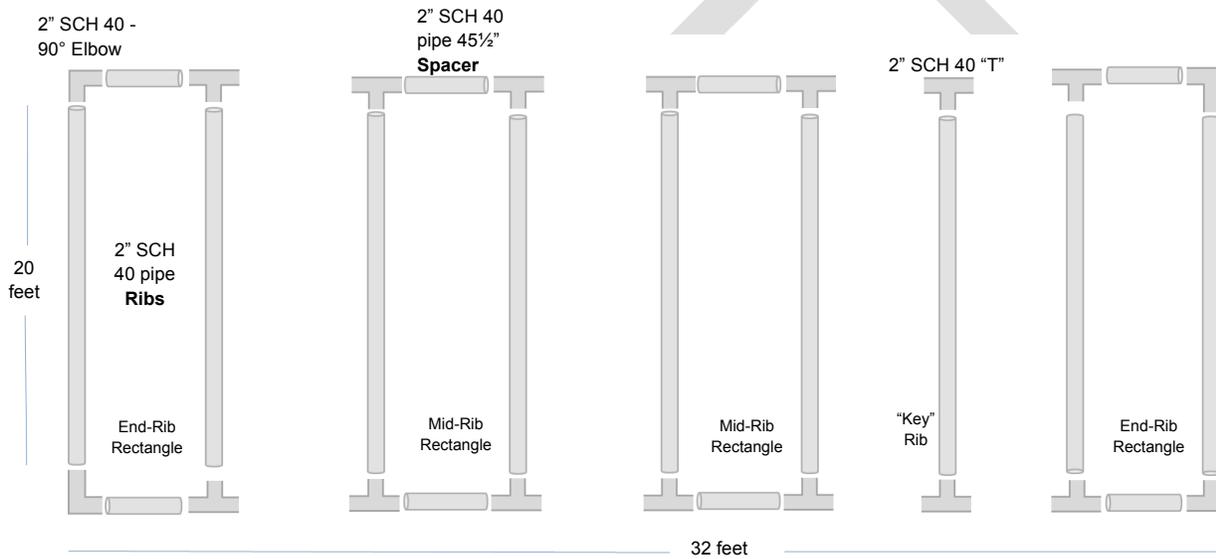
Schematic of 16' x 32' High Tunnel Rib assembly. Additional spacers between the rib assemblies will be added when the ribs are attached to the wooden base.
